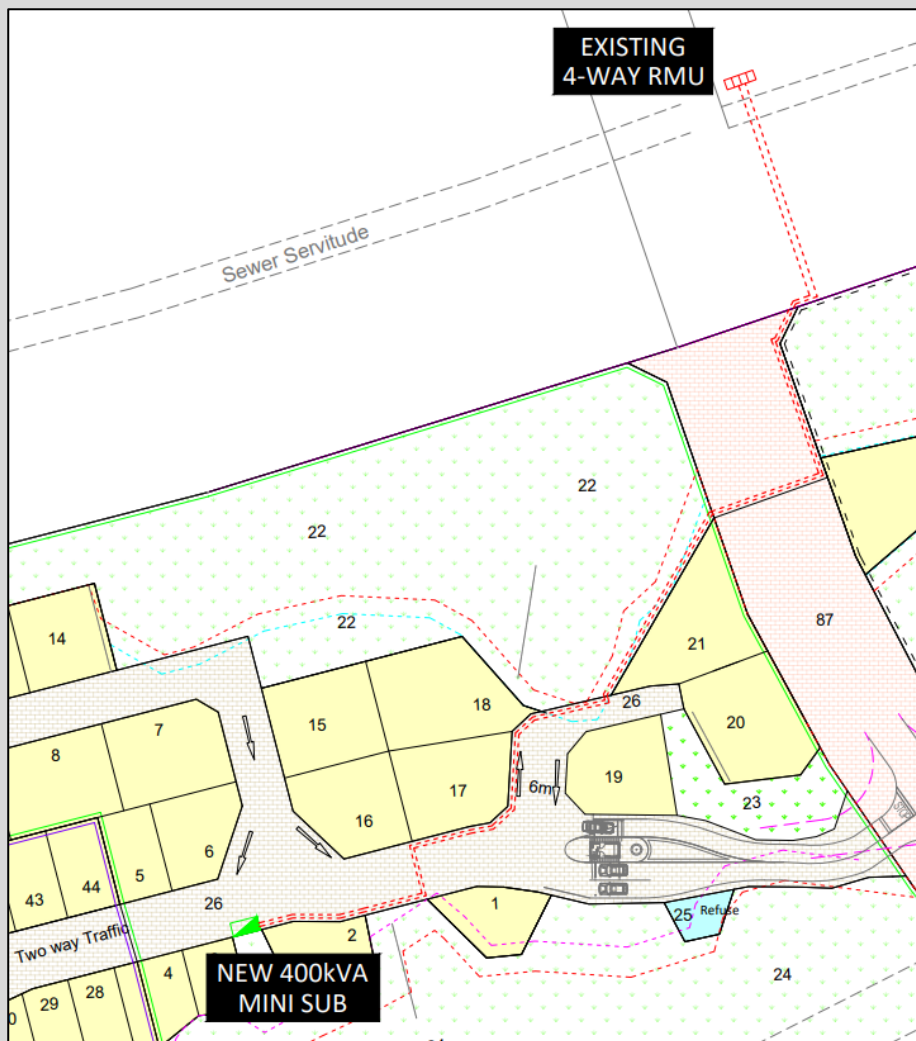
Connection of new mini substation to existing 4-way RMU (CVW Mechanical and Electrical Engineers, 2024).
